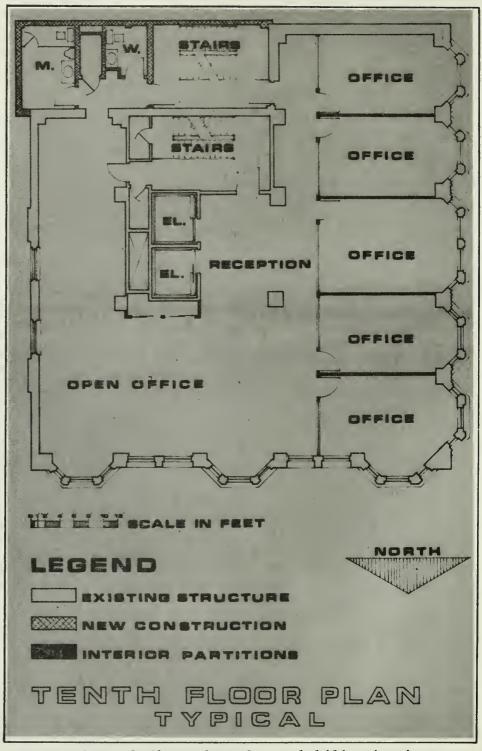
The 10th-floor plan after rehabilitation is typical of all upper floors. Office space on the west side of the building has remained partitioned, while space on the north has been opened up. Note the new stair tower with restrooms in the southeast corner. (Courtesy of the Urban Land Institute)
